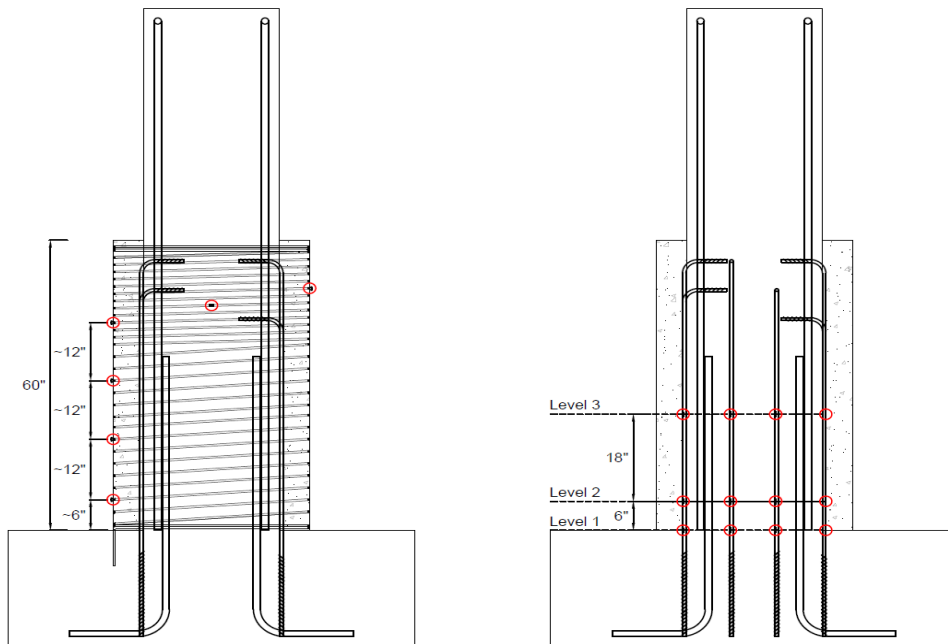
Specimen R-S-D-LTi-90: Strain gage layout (a) Starter bars (left) (b) Column bars (right)
